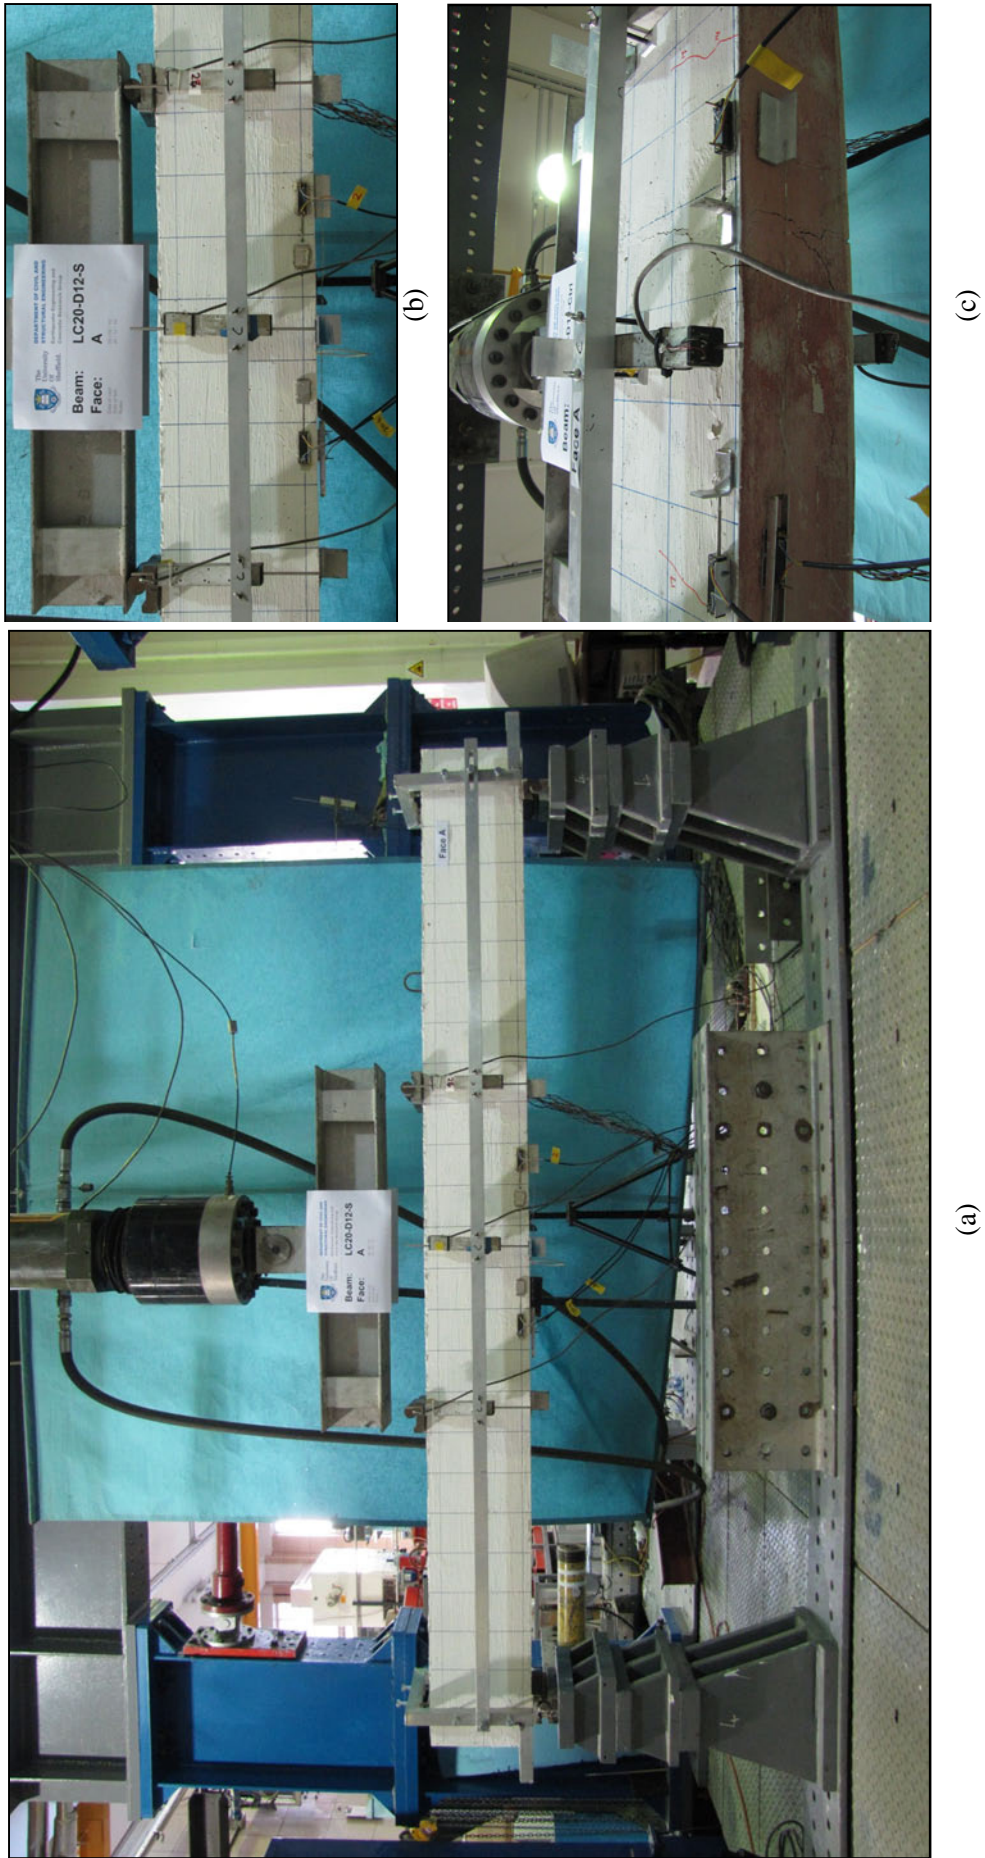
(a) Test specimen in the test rig with instrumentation installed b) & c) side and isometric view of the setup at the splice zone
